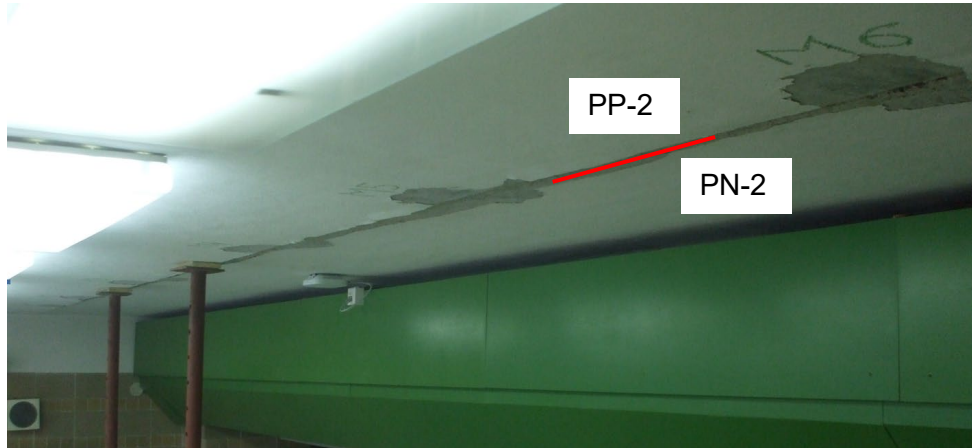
View of the reinforced concrete ceiling panels in room 2106
